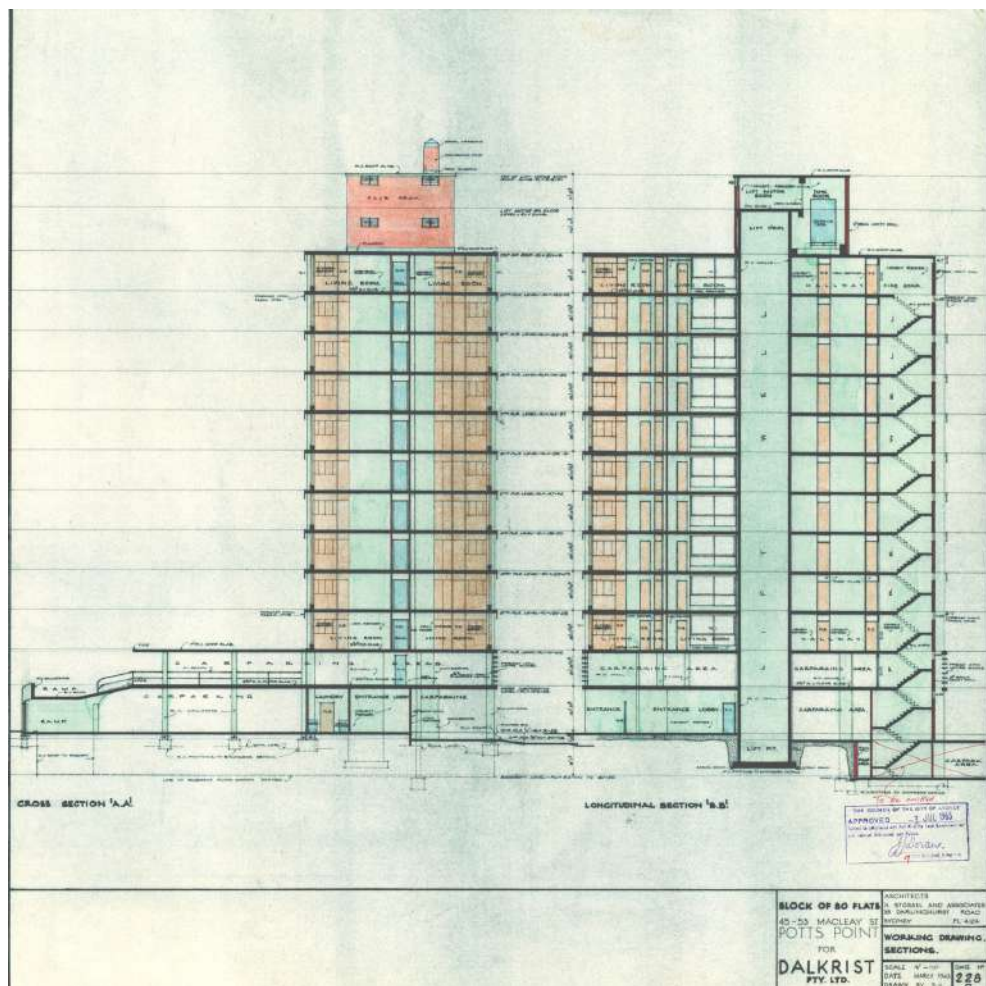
Plan of the section of the implemented design of March 1963 designed by Hugo Stossel for Dalkrist Pty Ltd
